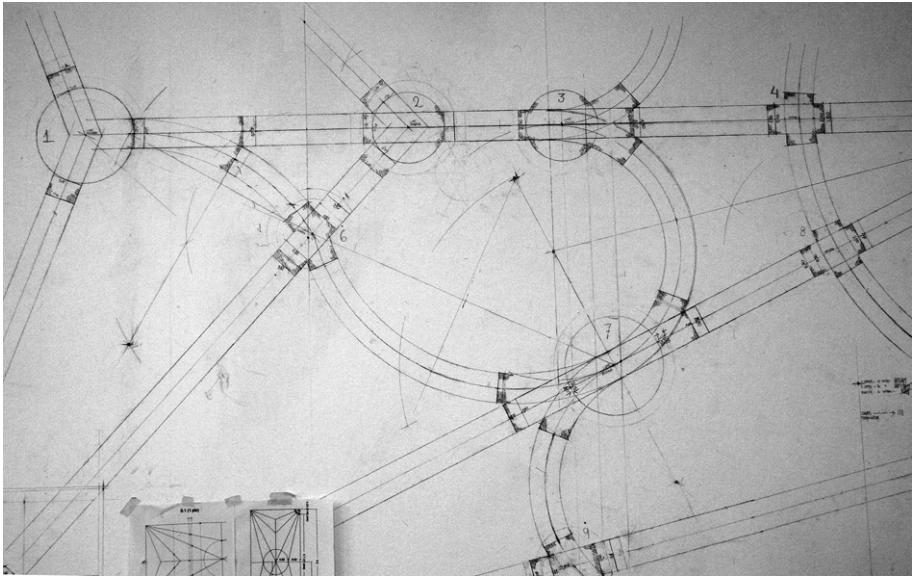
Full-scale tracings drawn on the wall destined for the construction of a reduced-scale model of the vault
